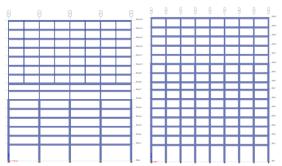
Elevation of Building Model-1 along y-dir. Fig 4: Elevation of Building Model-1 along x-dir.
